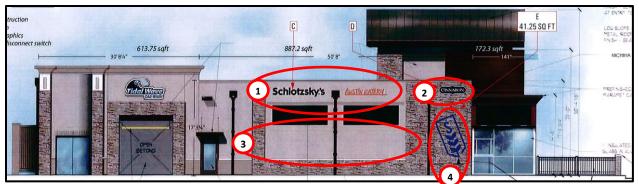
North Elevation—REVISED Requested wall signage (May 2019)
